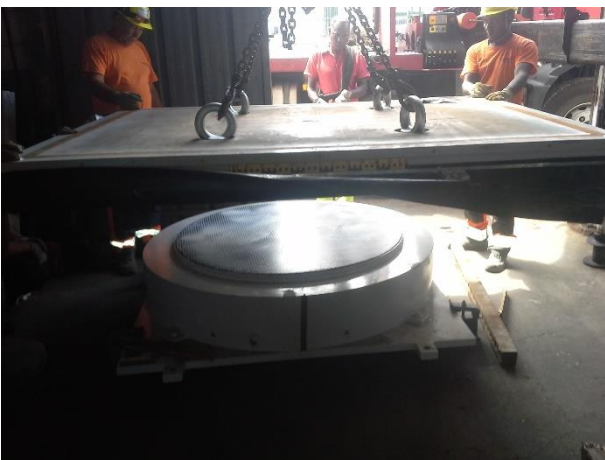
Placing of large sliding plate (with stainless steel sheet on lower surface) on top surface of the piston, following placing and greasing of sliding material on top of piston
